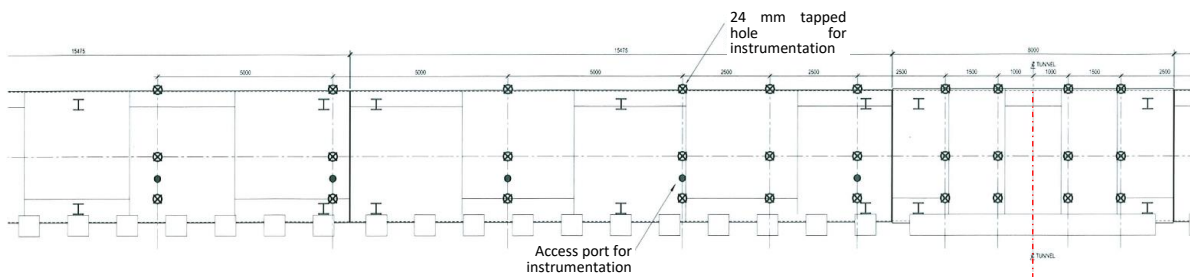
External elevation shows port locations. Port positions are mirrored around centre-line (in red) and on both side elevations
